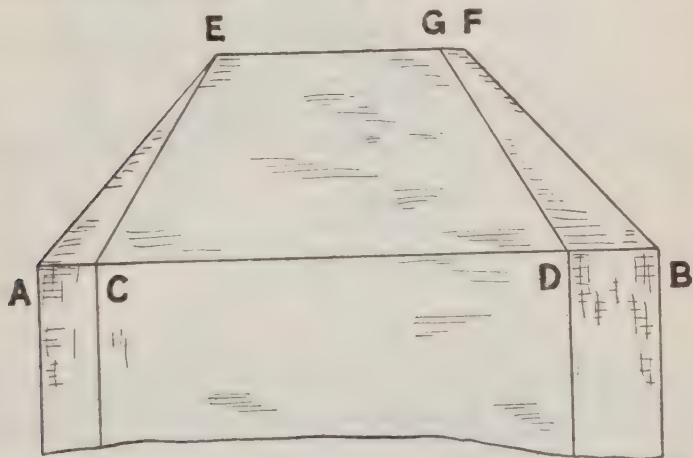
,027.—View of irregular roof shown in plan and laid out graphically in fig. 2,026.
